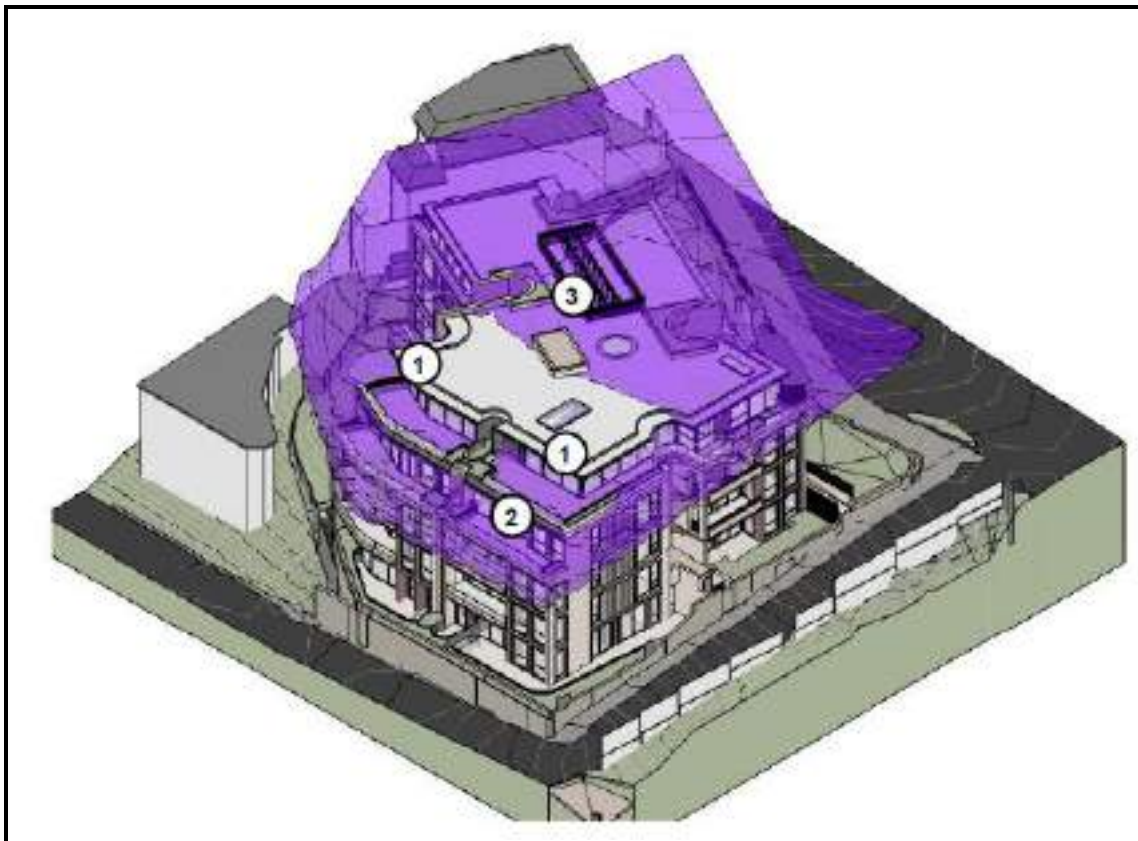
Height plane diagram showing the arse of the proposed building that exceed the maximum building height.
